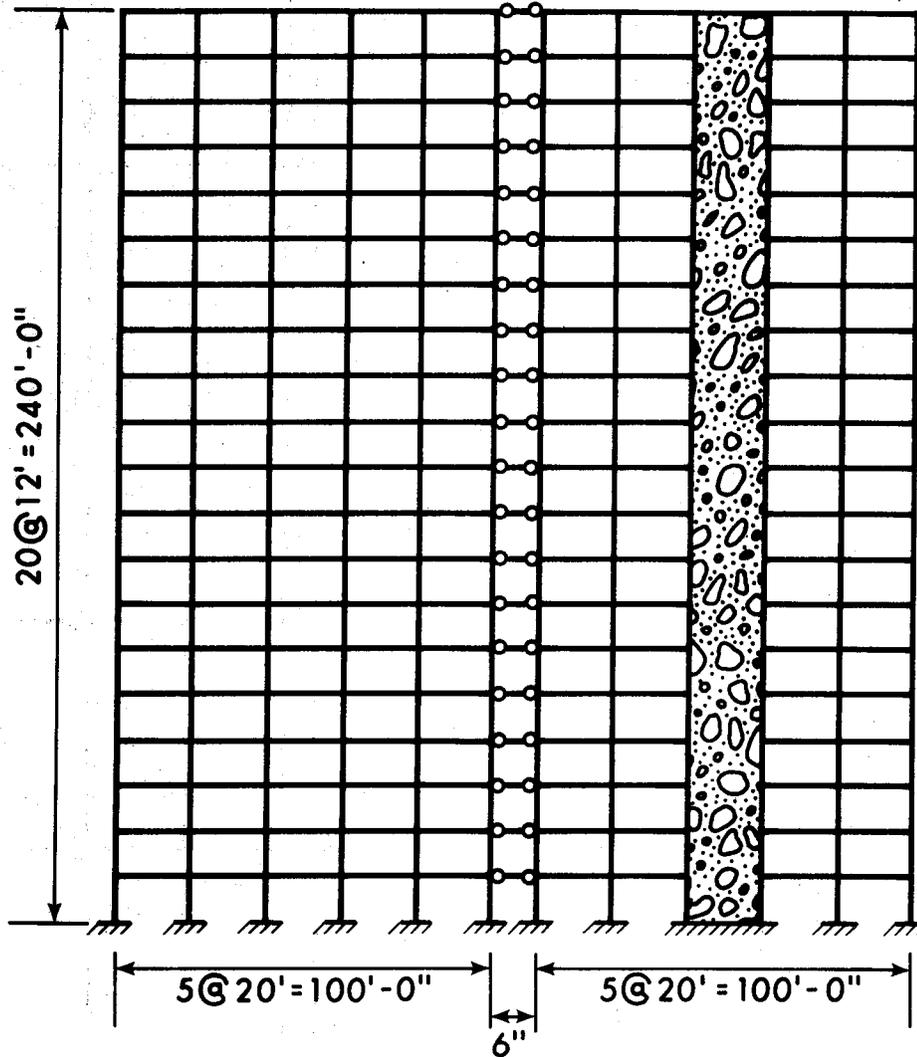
ELEVATION OF FRAME TYPE SIX
